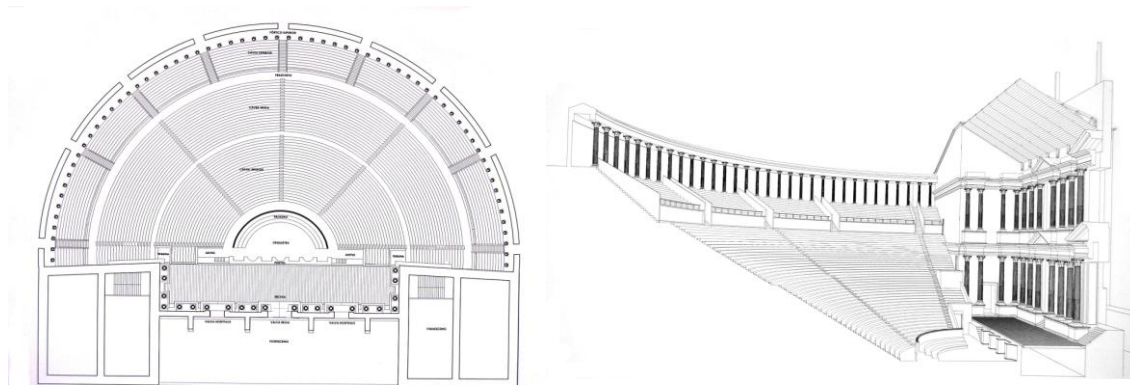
Plans of Clunia Theatre: ground floor and longitudinal section
